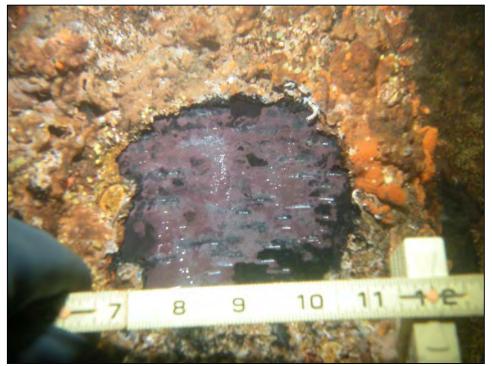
Observed steel sheetpile condition underwater (Photo by Childs Engineering Corp.)
